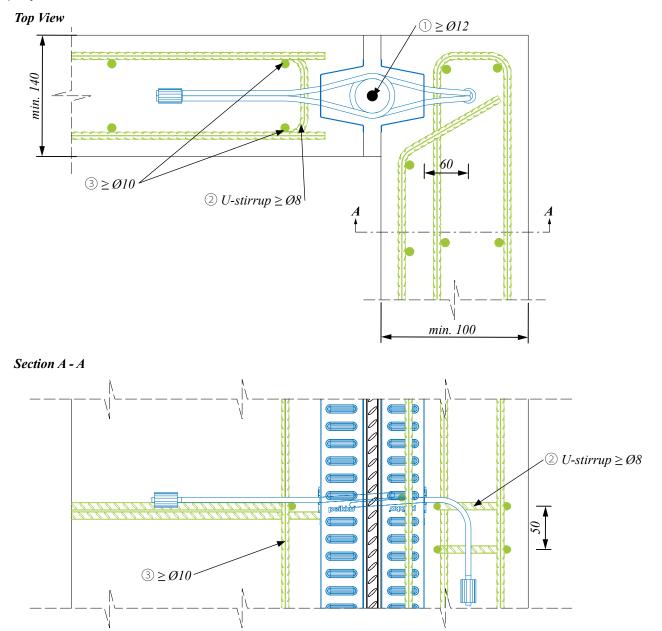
Reinforcement at wall end with WILORA® 50 Connecting Rails.
